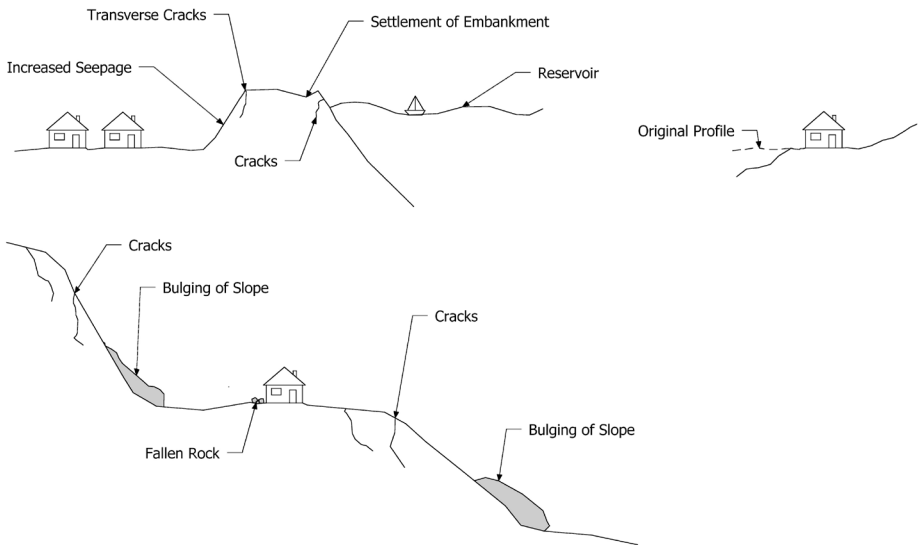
Inspection points for some geotechnical hazards; Top left: Potential slope failure, Top right: Loss of foundation support, Bottom: Unsafe area
